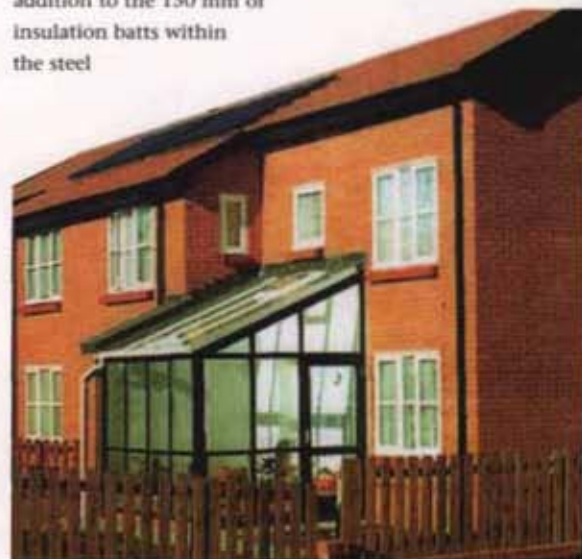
Three-bedroom housing at Clase with sunspace and solar water heating on roof
